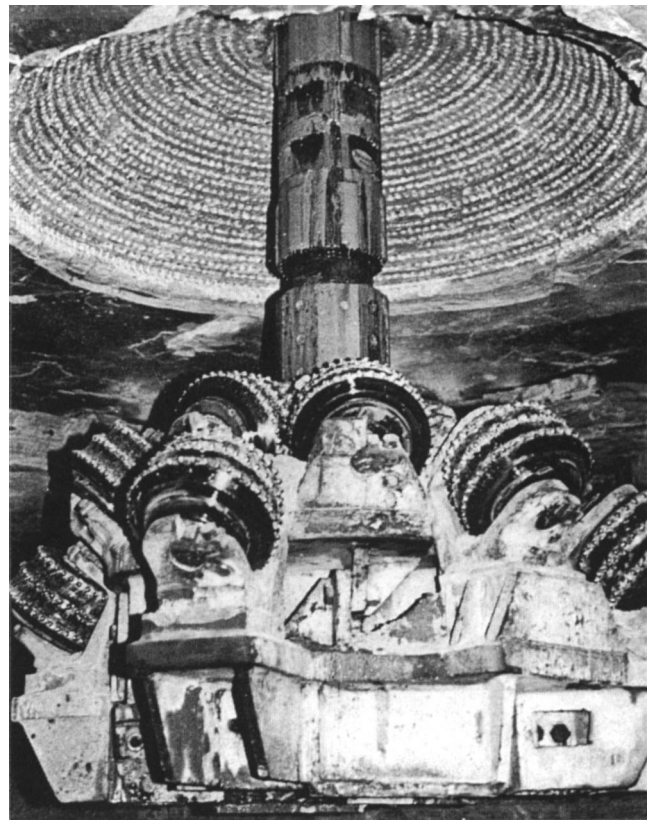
Top section of 16-ft (4.8-m) diameter reamer breaking through the surface after 1490 ft (453 m) of reaming.
